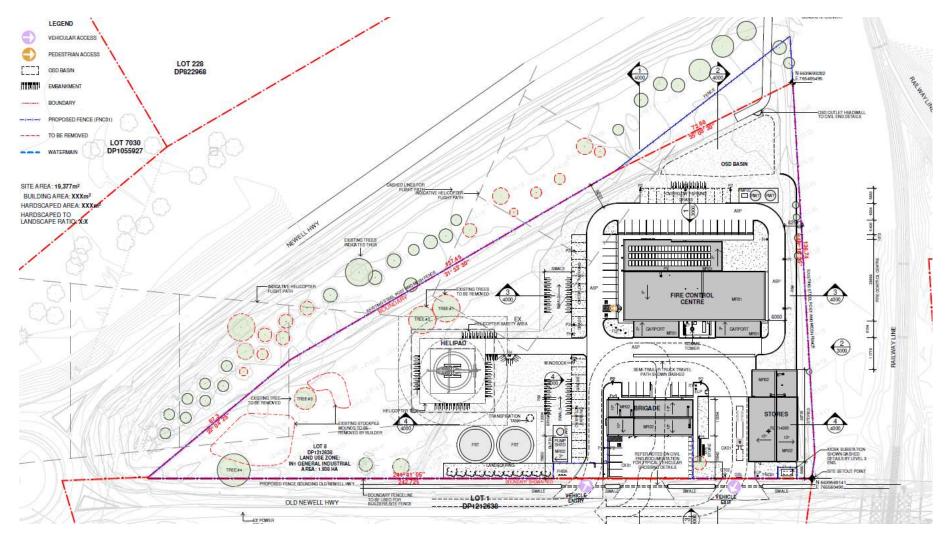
Proposed Site Plan (NBRS, 28 September 2023
